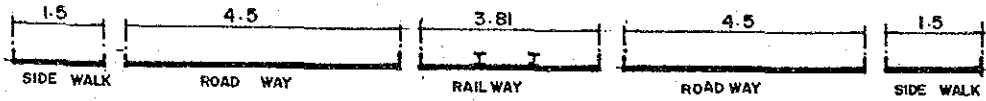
CROSS SECTIONS OF BRIDGE
